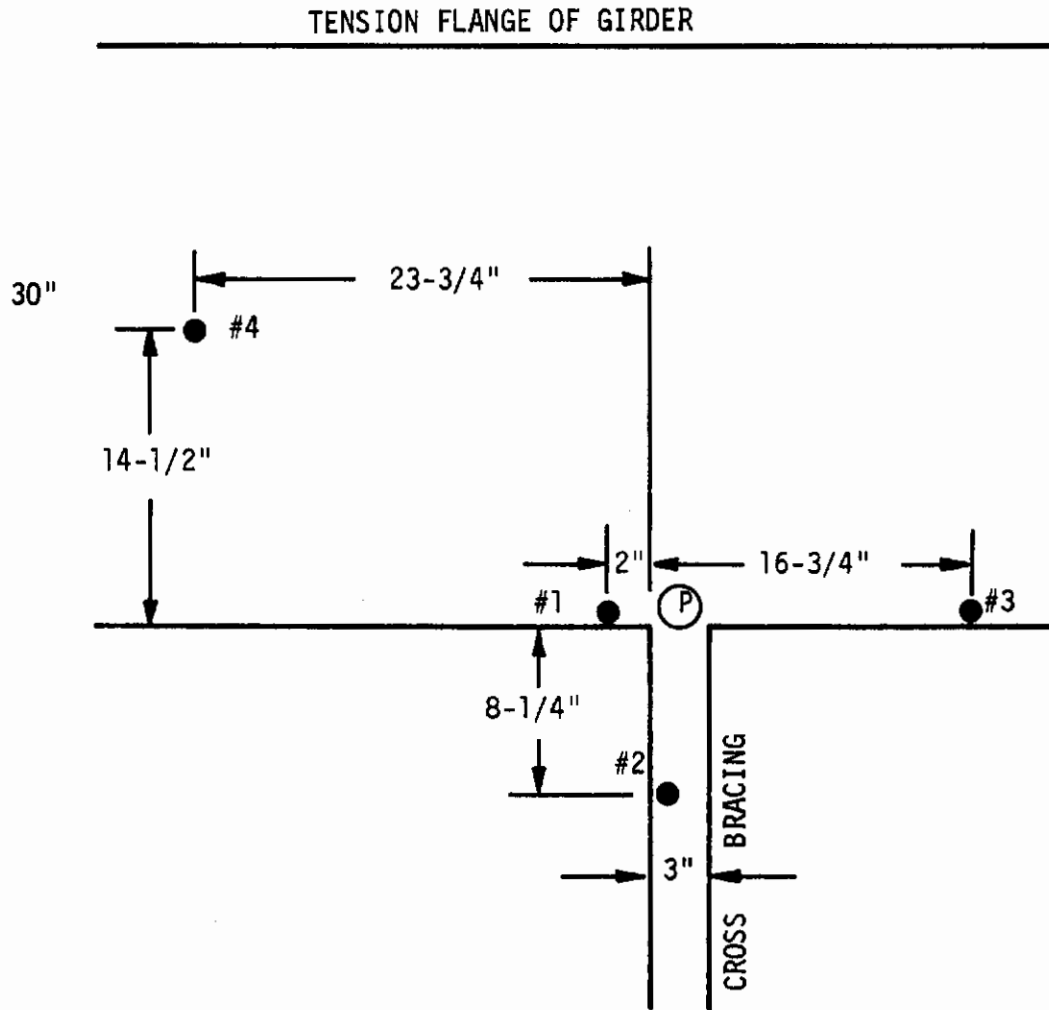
Schematic of the Systems Used in Monitoring a Cracked Girder in a Large Steel Structure
